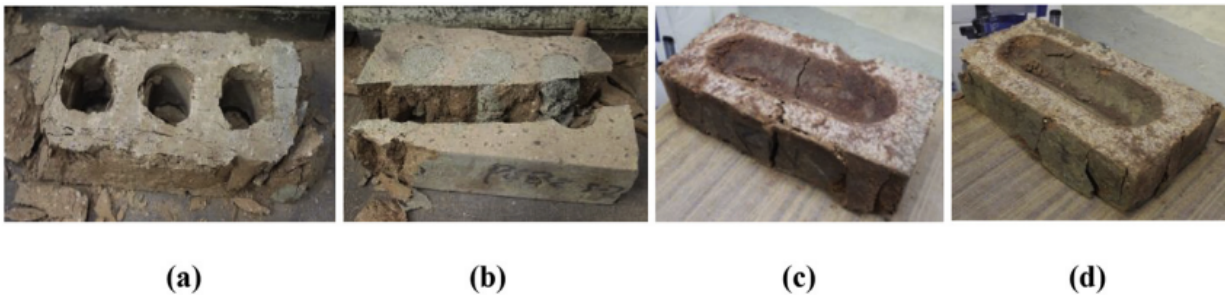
Failure modes of bricks. (a) reclaimed perforated brick without infill (b) reclaimed perforated brick with infill (c) frogged new brick (d) reclaimed frogged bricks (Zhou et al., 2020)
